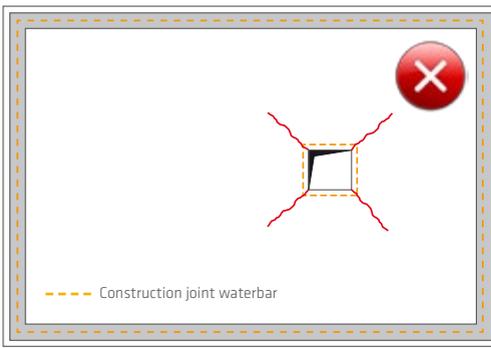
Diagonal cracks at box-outs or shafts through a base slab
